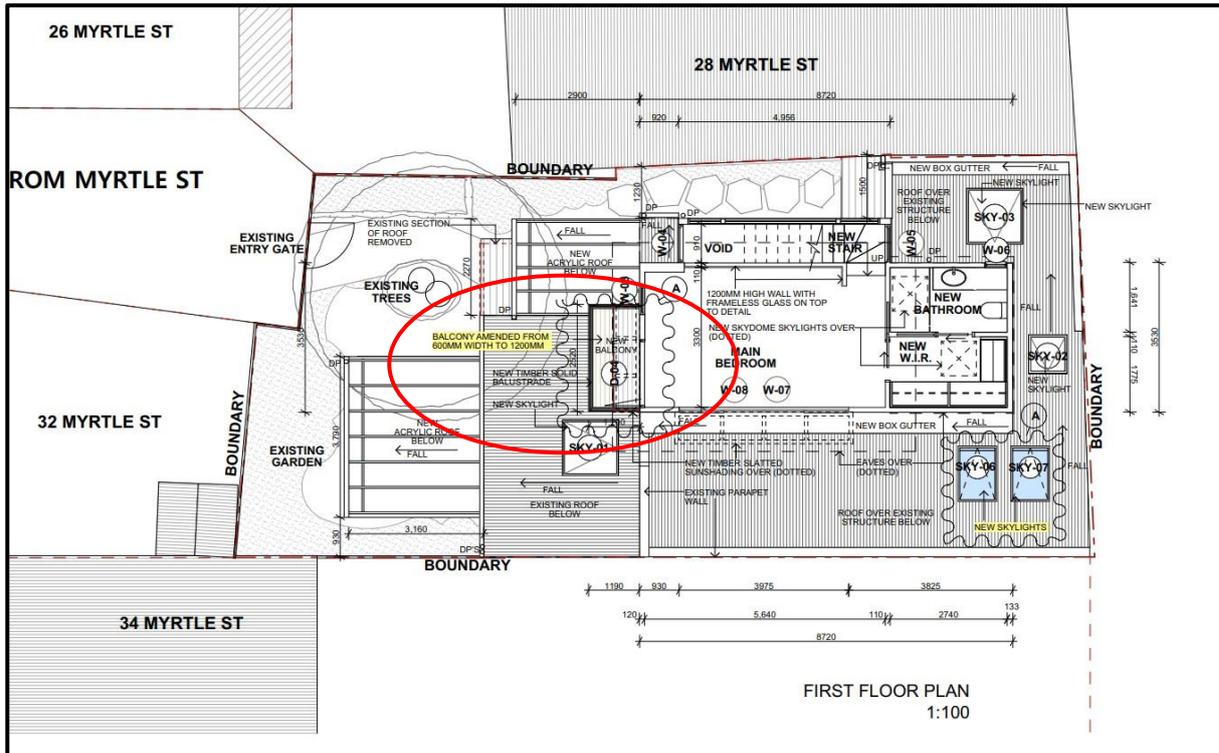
Proposed first floor plan showing balcony extending from 0.6m to 1.2m (in depth) (circled in red)
